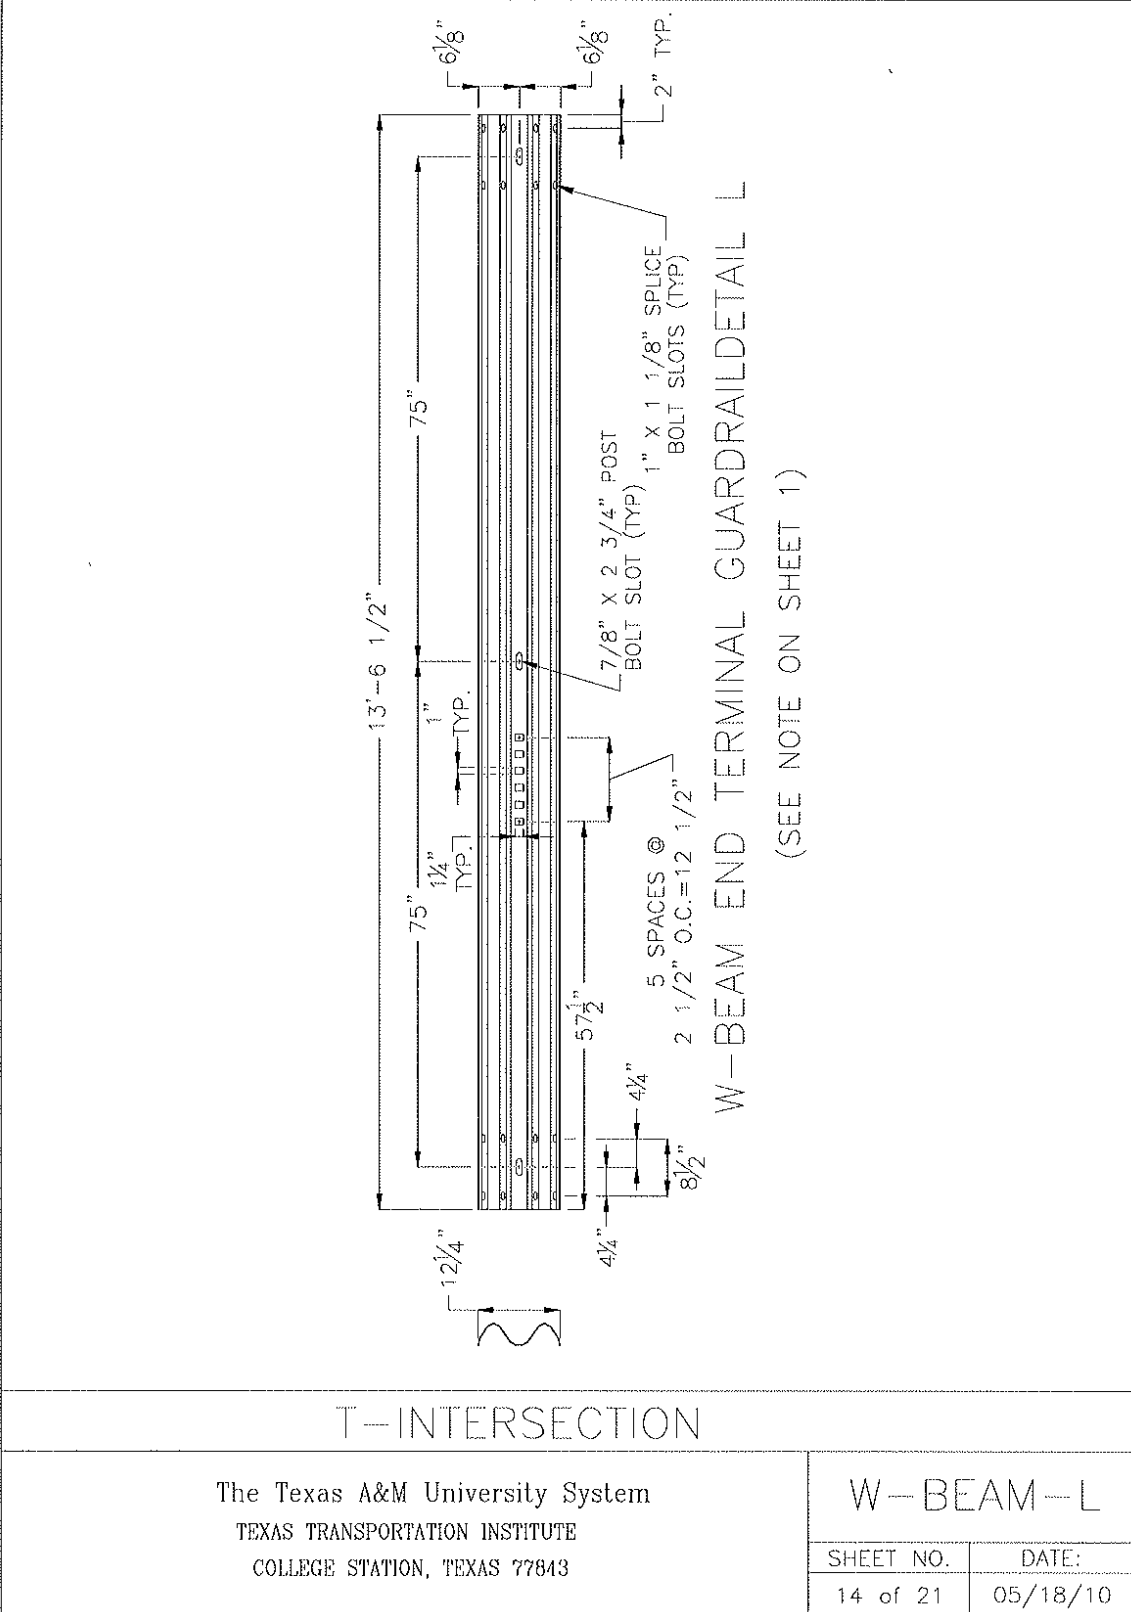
Rail Punch Details for W-Beam at End Anchorage [27]
